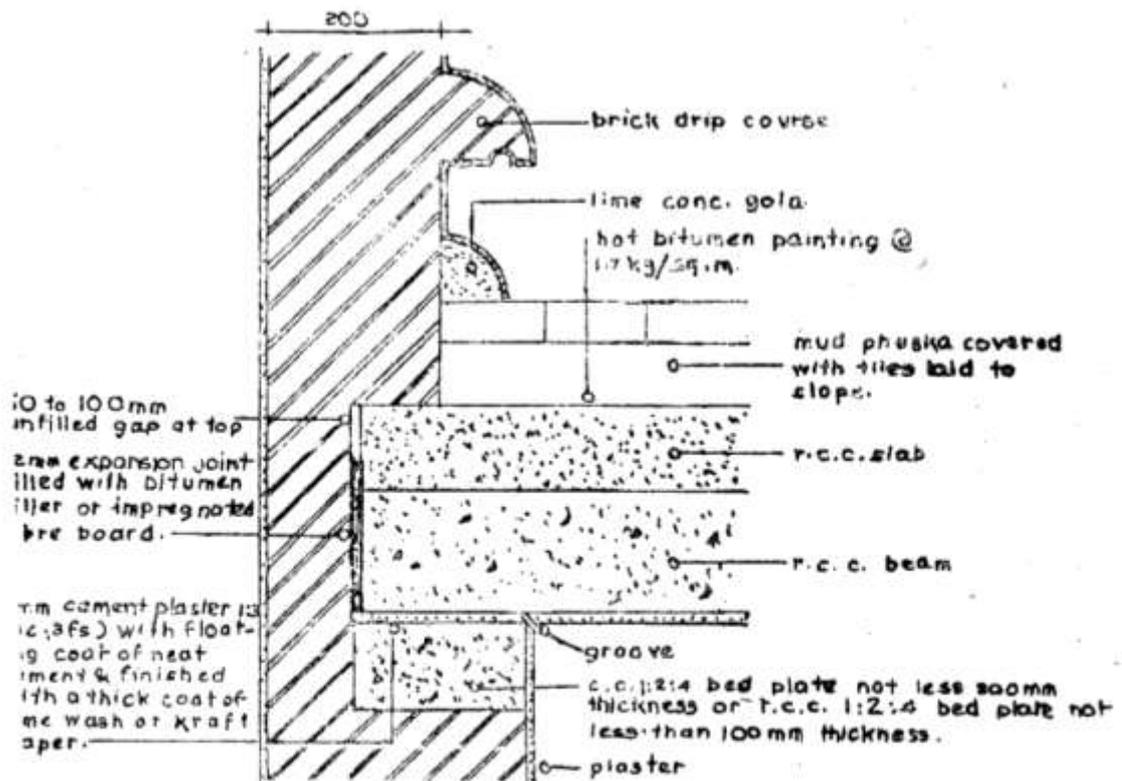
Brick Work - End Wall with Suspended Floor Slab and Roof Beam
